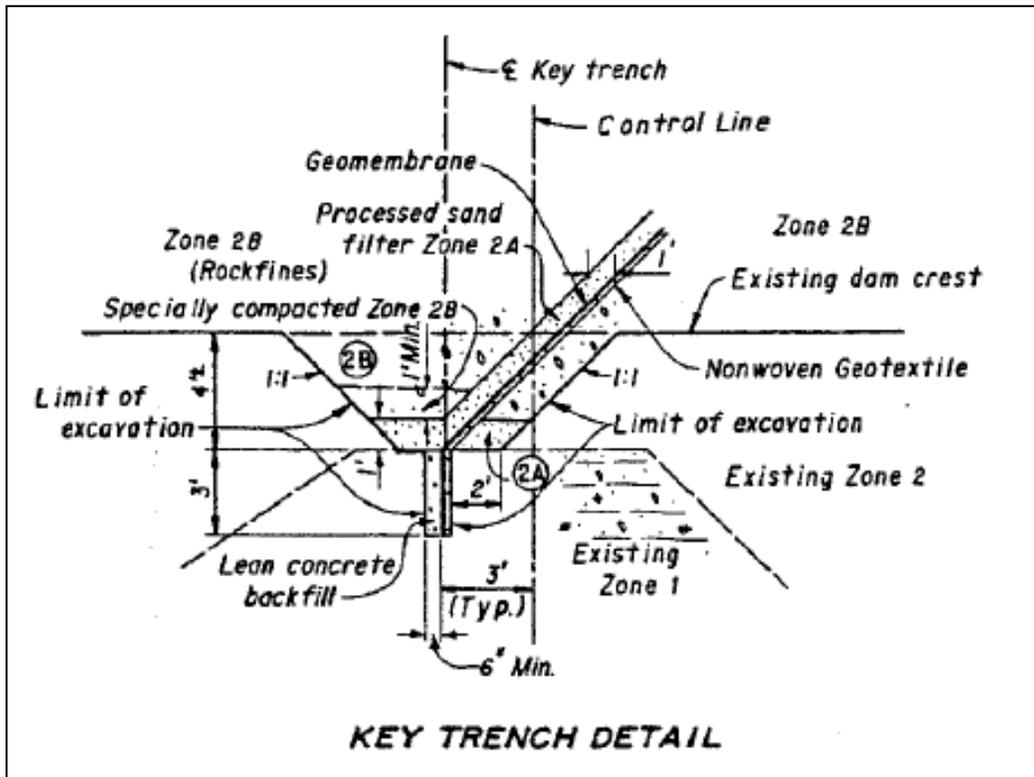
Pactola Dam geomembrane key trench tying into existing core zone.
